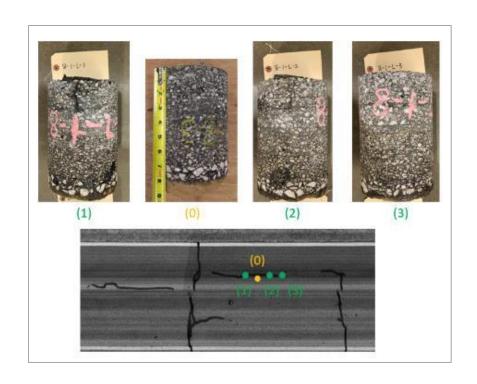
Photo. Cores on Sealed Longitudinal Crack (Site 8)
